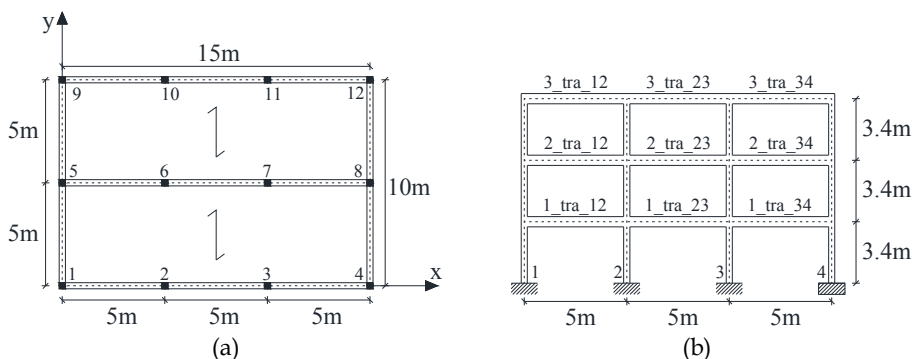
Geometry and details of a typical RC existing building: (a) plan; (b) lateral view of a typical resisting frame.
